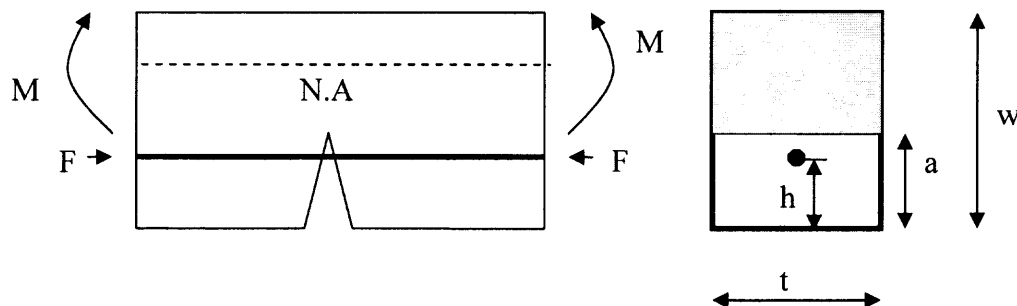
Cracked Reinforced Concrete Beam Subjected to Pure Bending Moment.
